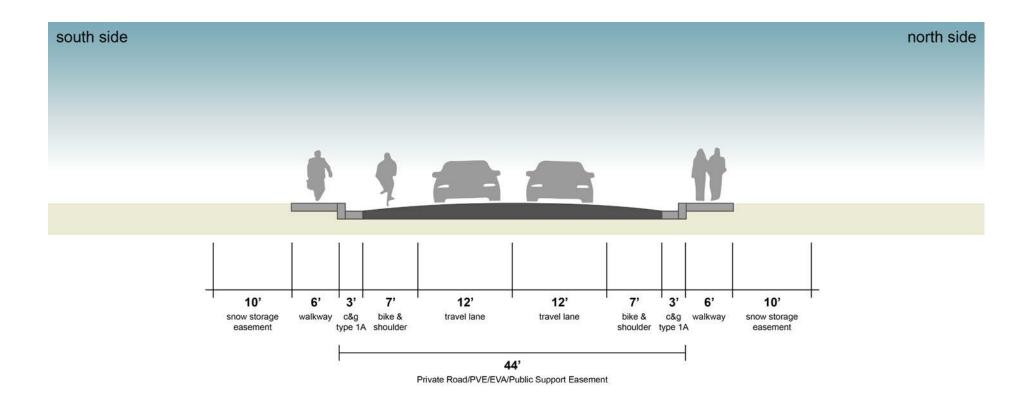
SECTION G: CHAMONIX PLACE
